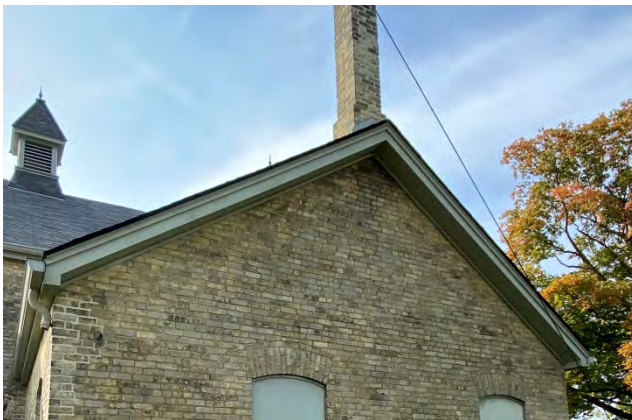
East Elevation Fascia (Photo No. 7.0)
